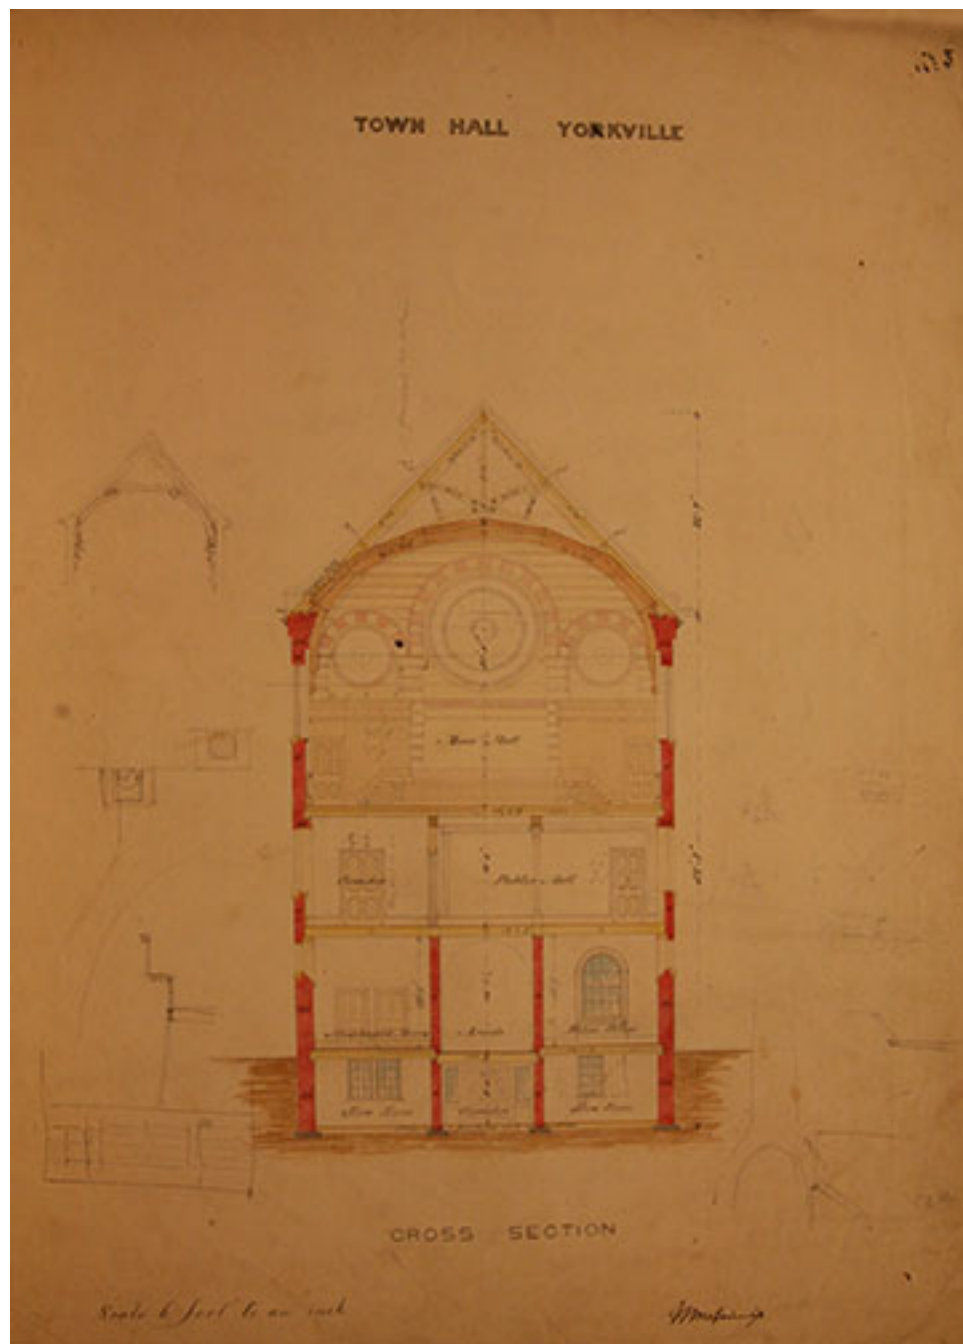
Town Hall, Yorkville, Ontario, drawing of cross section.
